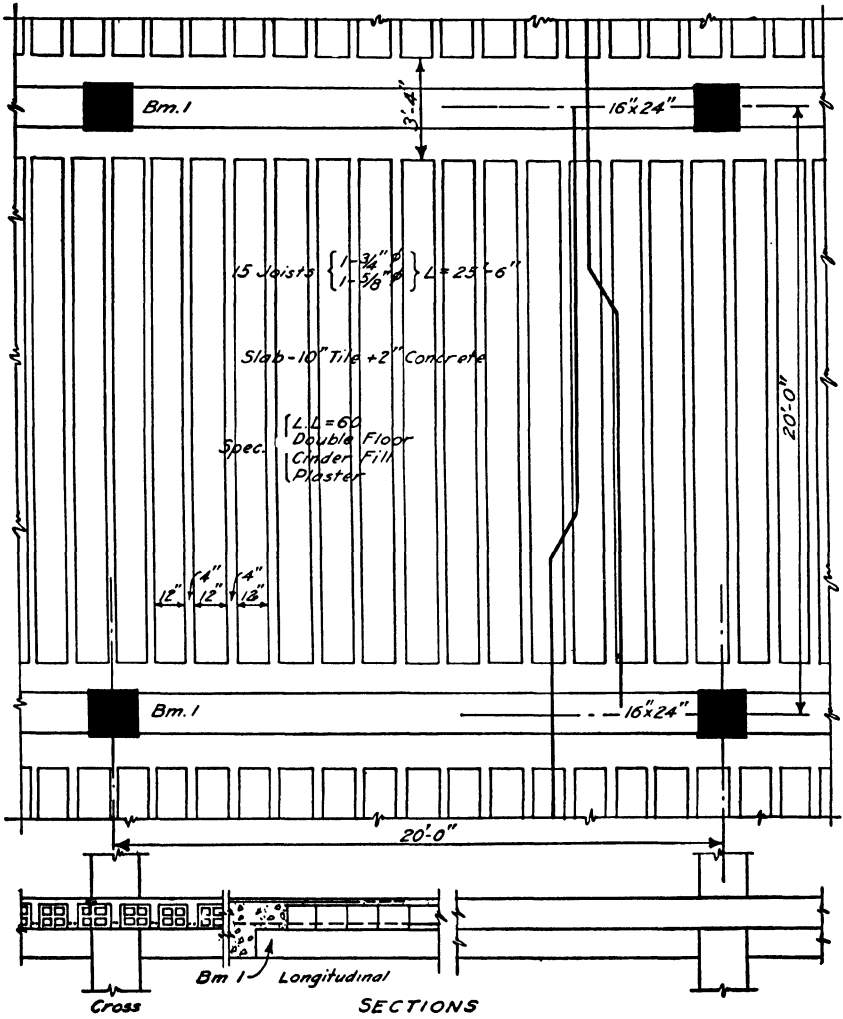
Framing for One-Way Terra Cotta Ribbed Slab in Concrete Frame.
